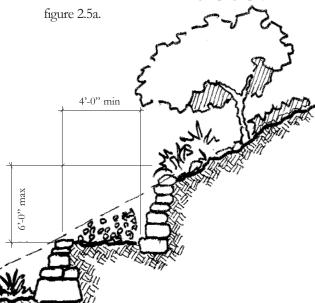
Retaining Wall Height and Terraced Wall Structures
